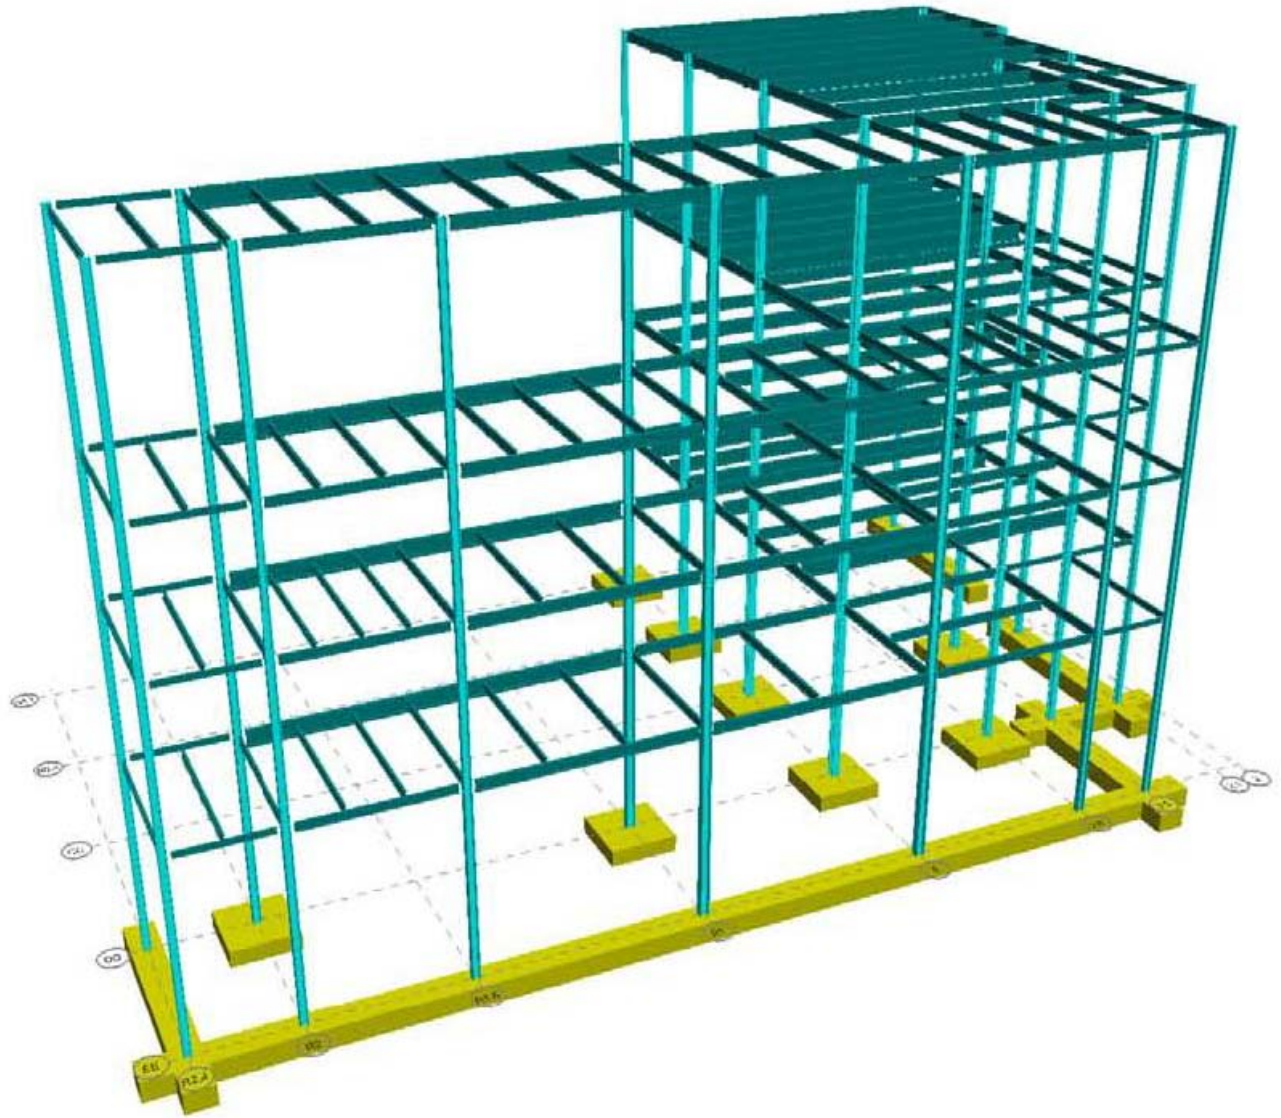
RAM Concept Model of proposed structural redesign
